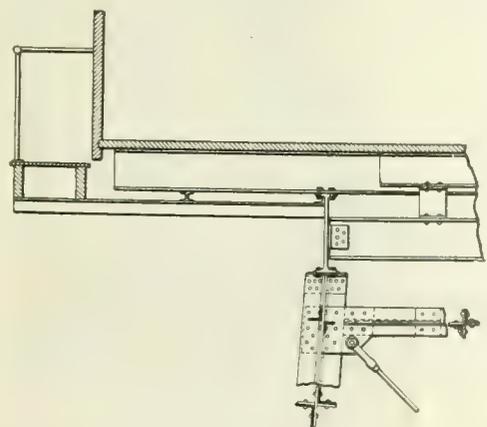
Detail of Arrangement of Steel I-Beam Grillage for Support of Tank.
